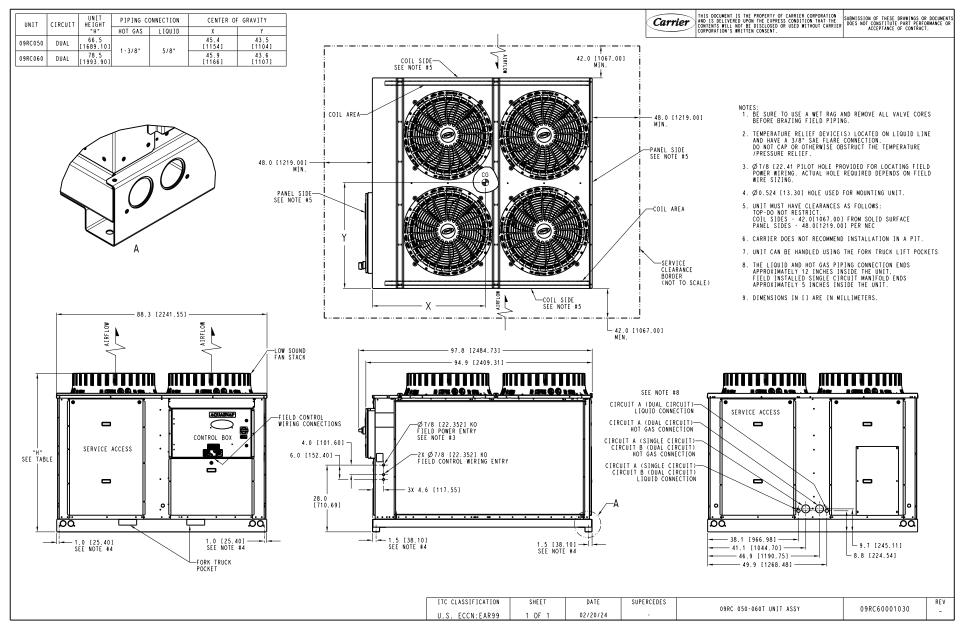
Unit Dimensions – 09RC050-060 Units
